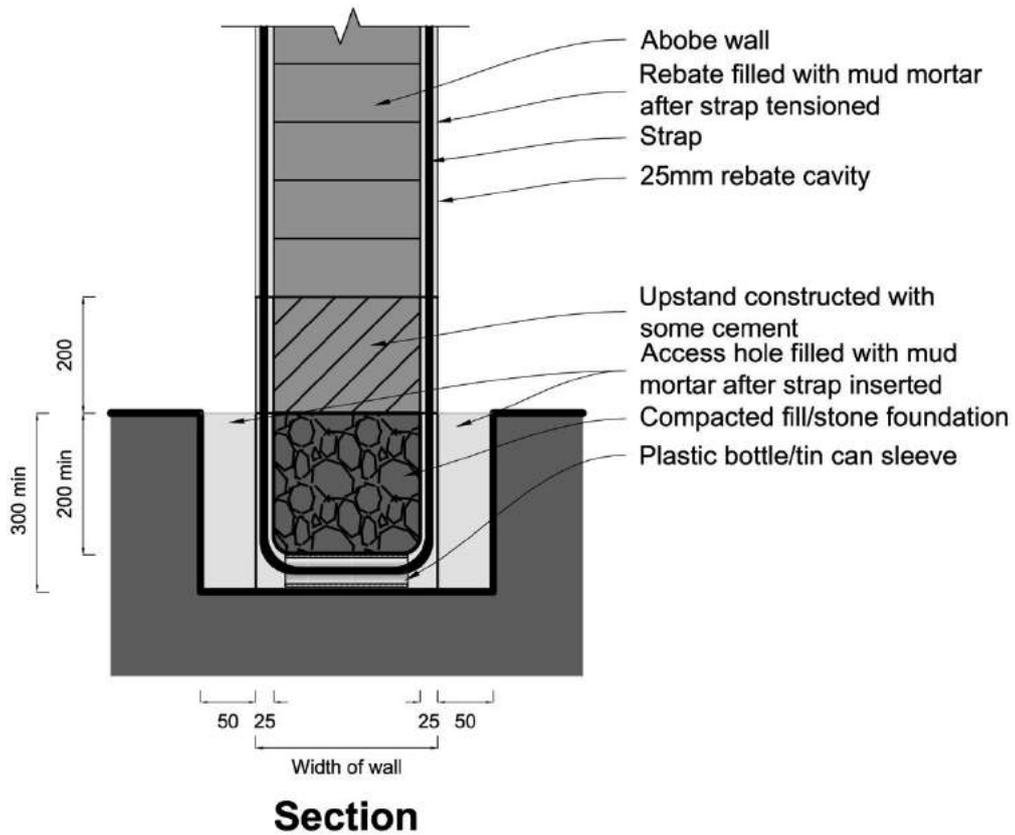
(a) Section through new wall construction showing a strap passing under the foundation and the position of the vertical strap in its rebate.
